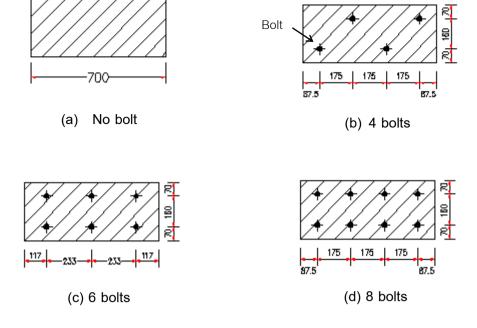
Panel geometry and bolt arrangement (unit: mm)
